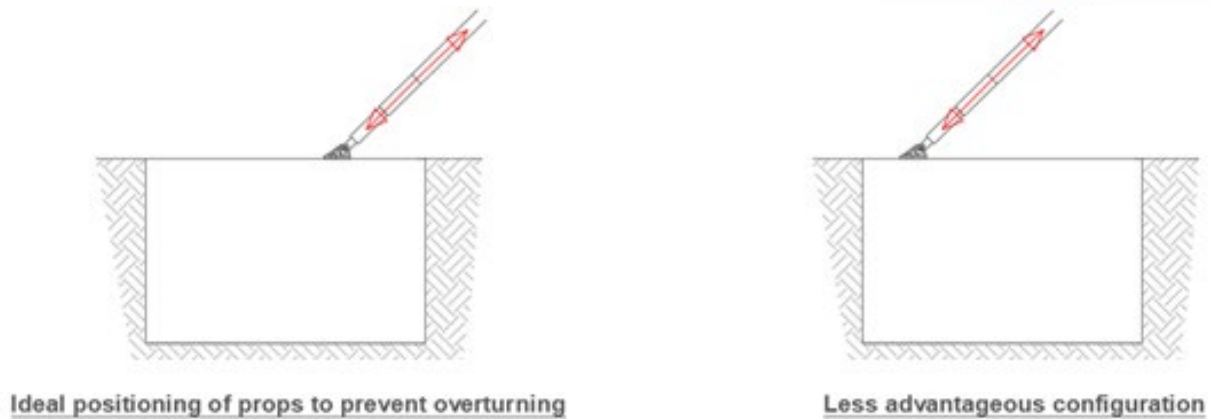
Ideal and less advantageous configurations of fixings to ballasts or footings for stability.
